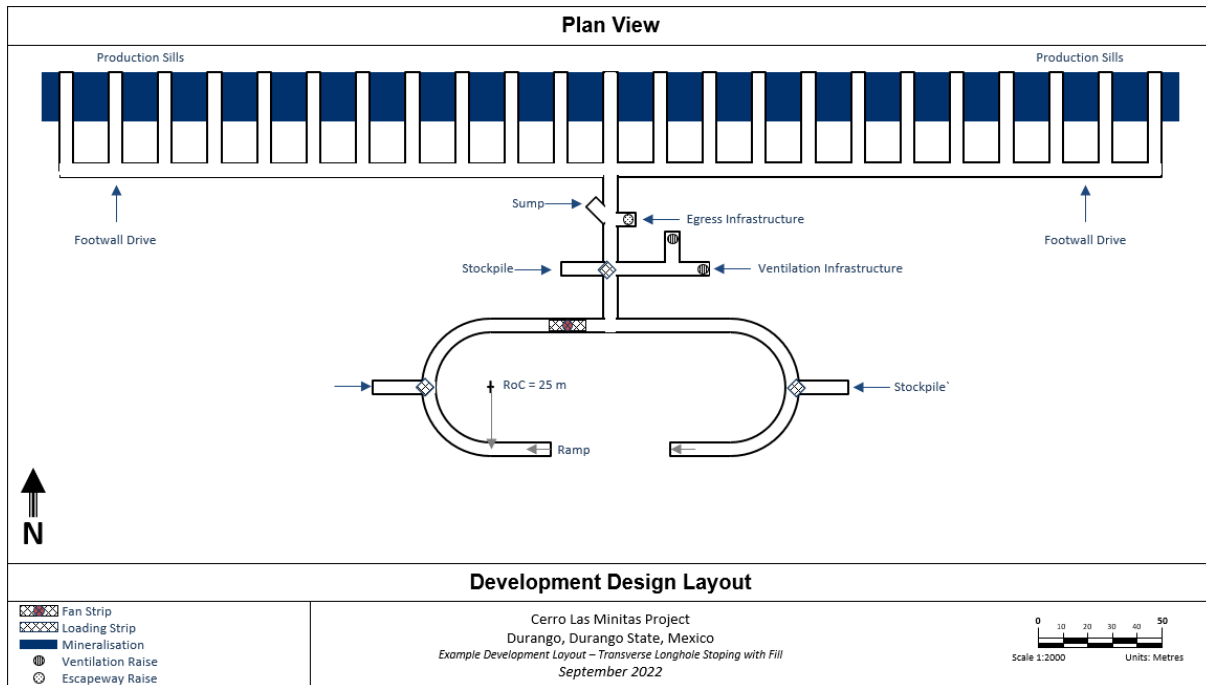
Cerro Las Minitas Transverse Longhole Stopping Level Layout
